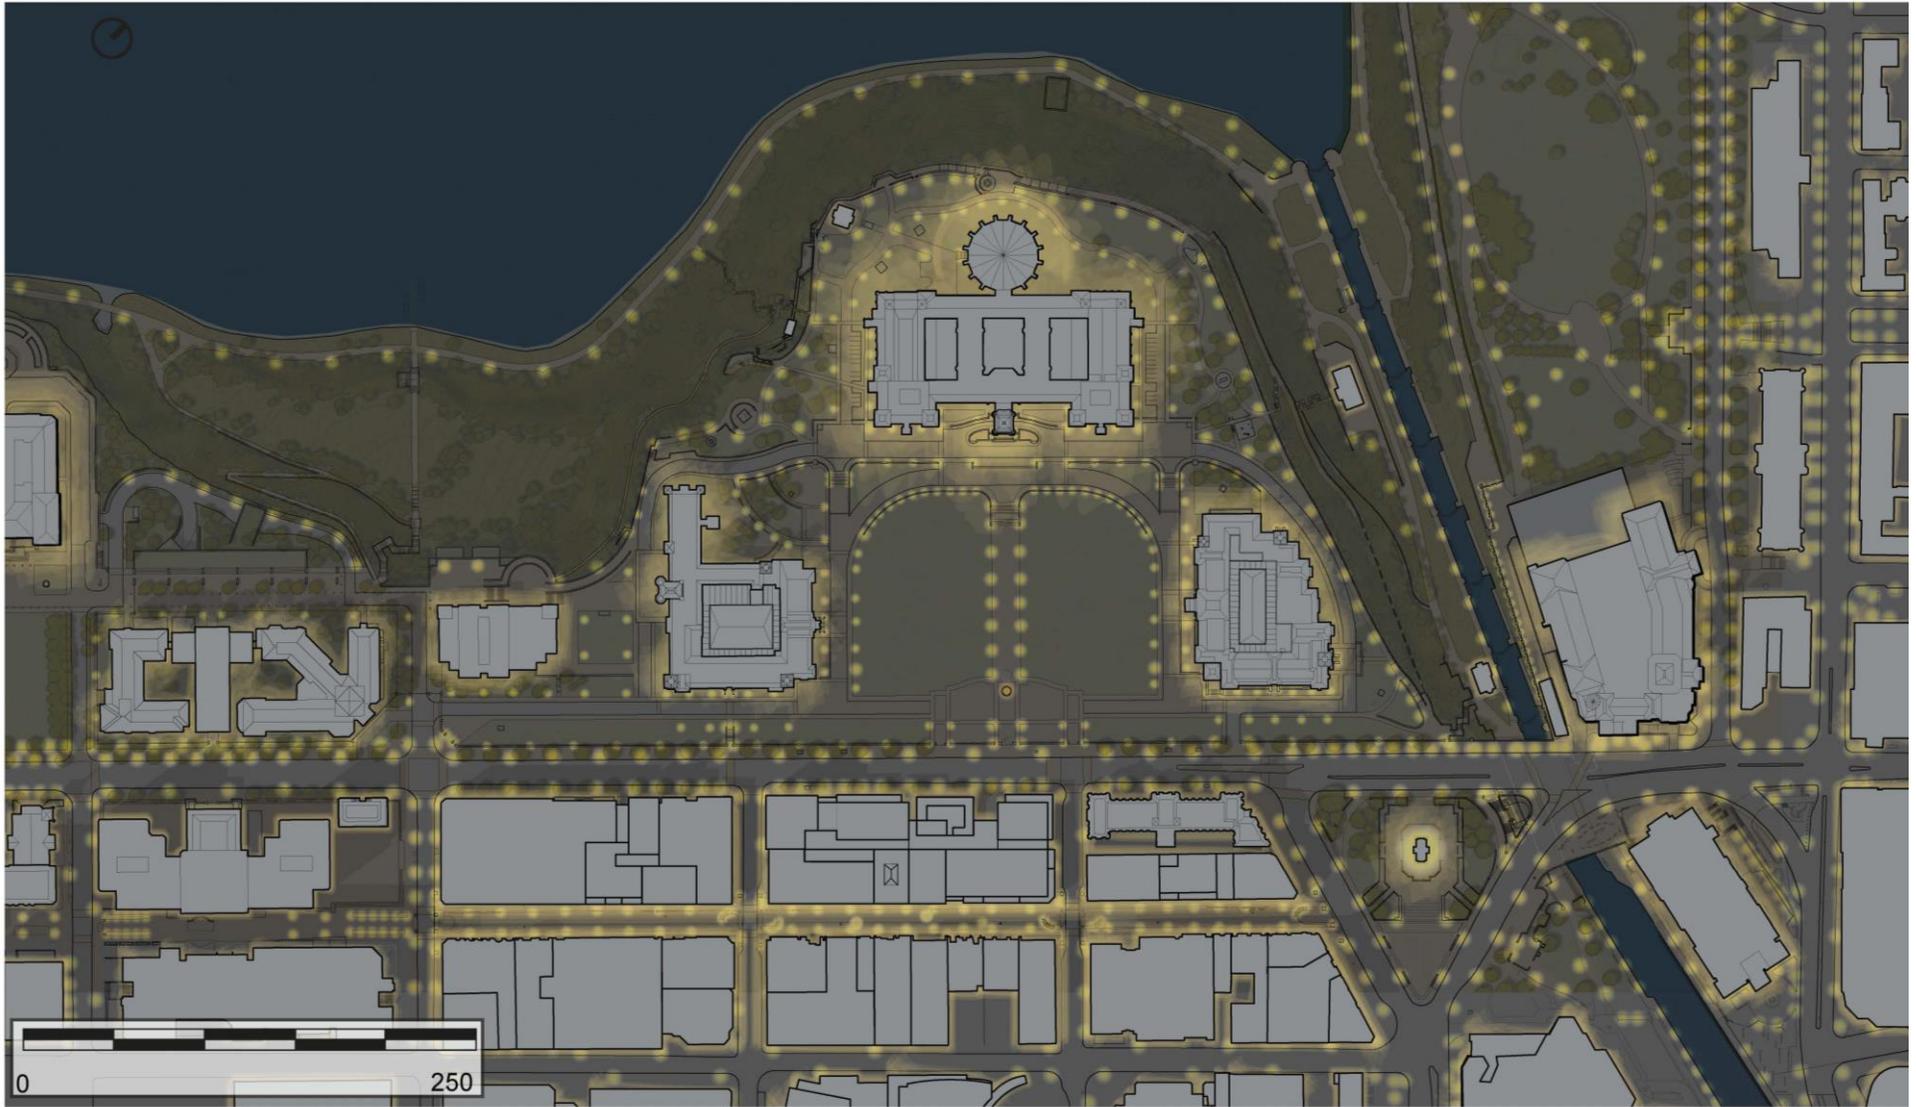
Exterior Lighting Master Plan: Proposed Lighting Plan
